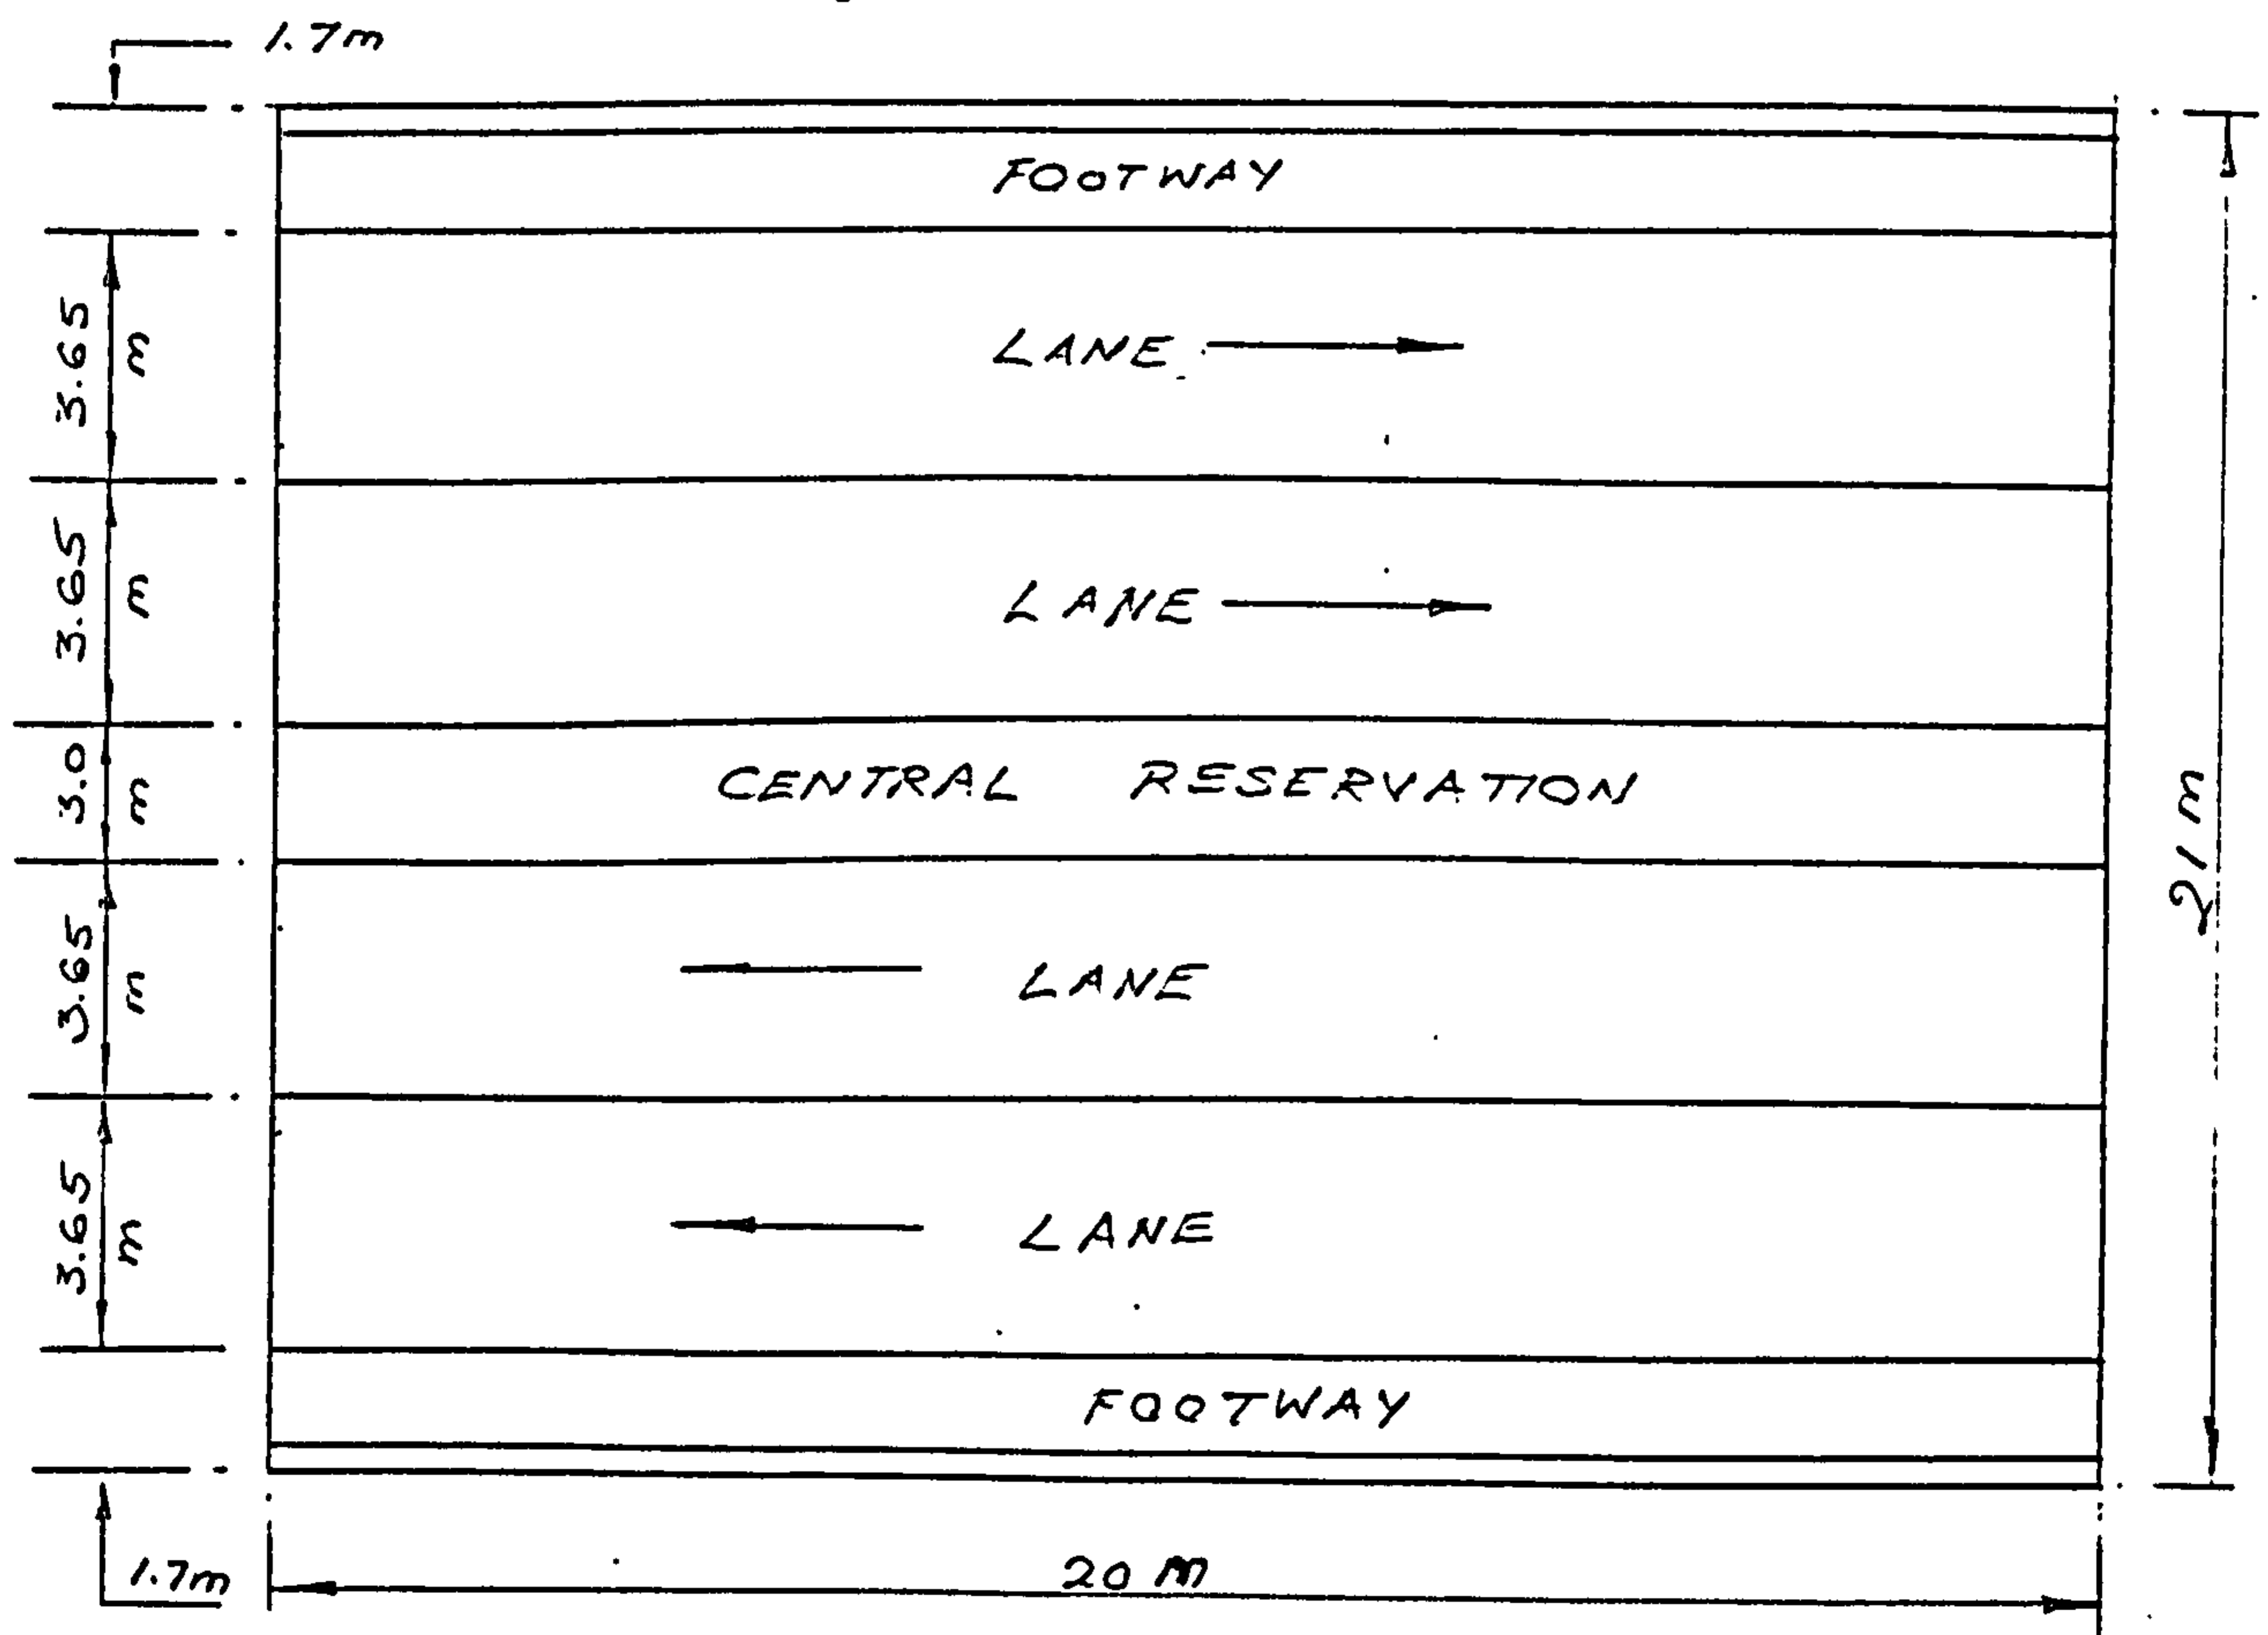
A 20m span two lane dual carriageway slab bridge.
